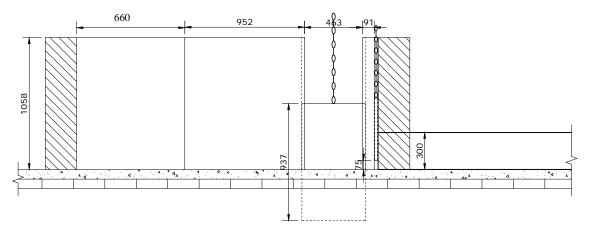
Section A-A (Section along Underflow Pipe of Flow Diversion Structure)
